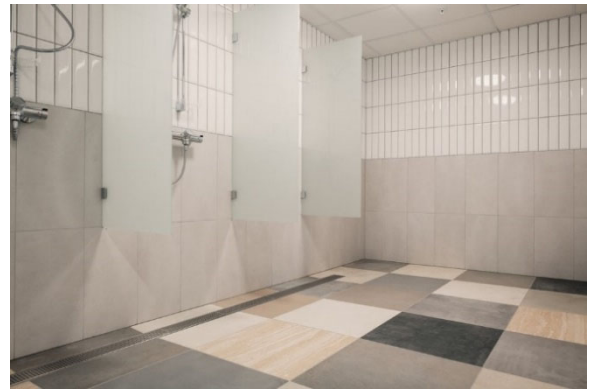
Reused floor tiles that were brought from outside of the building site.⁶⁴
